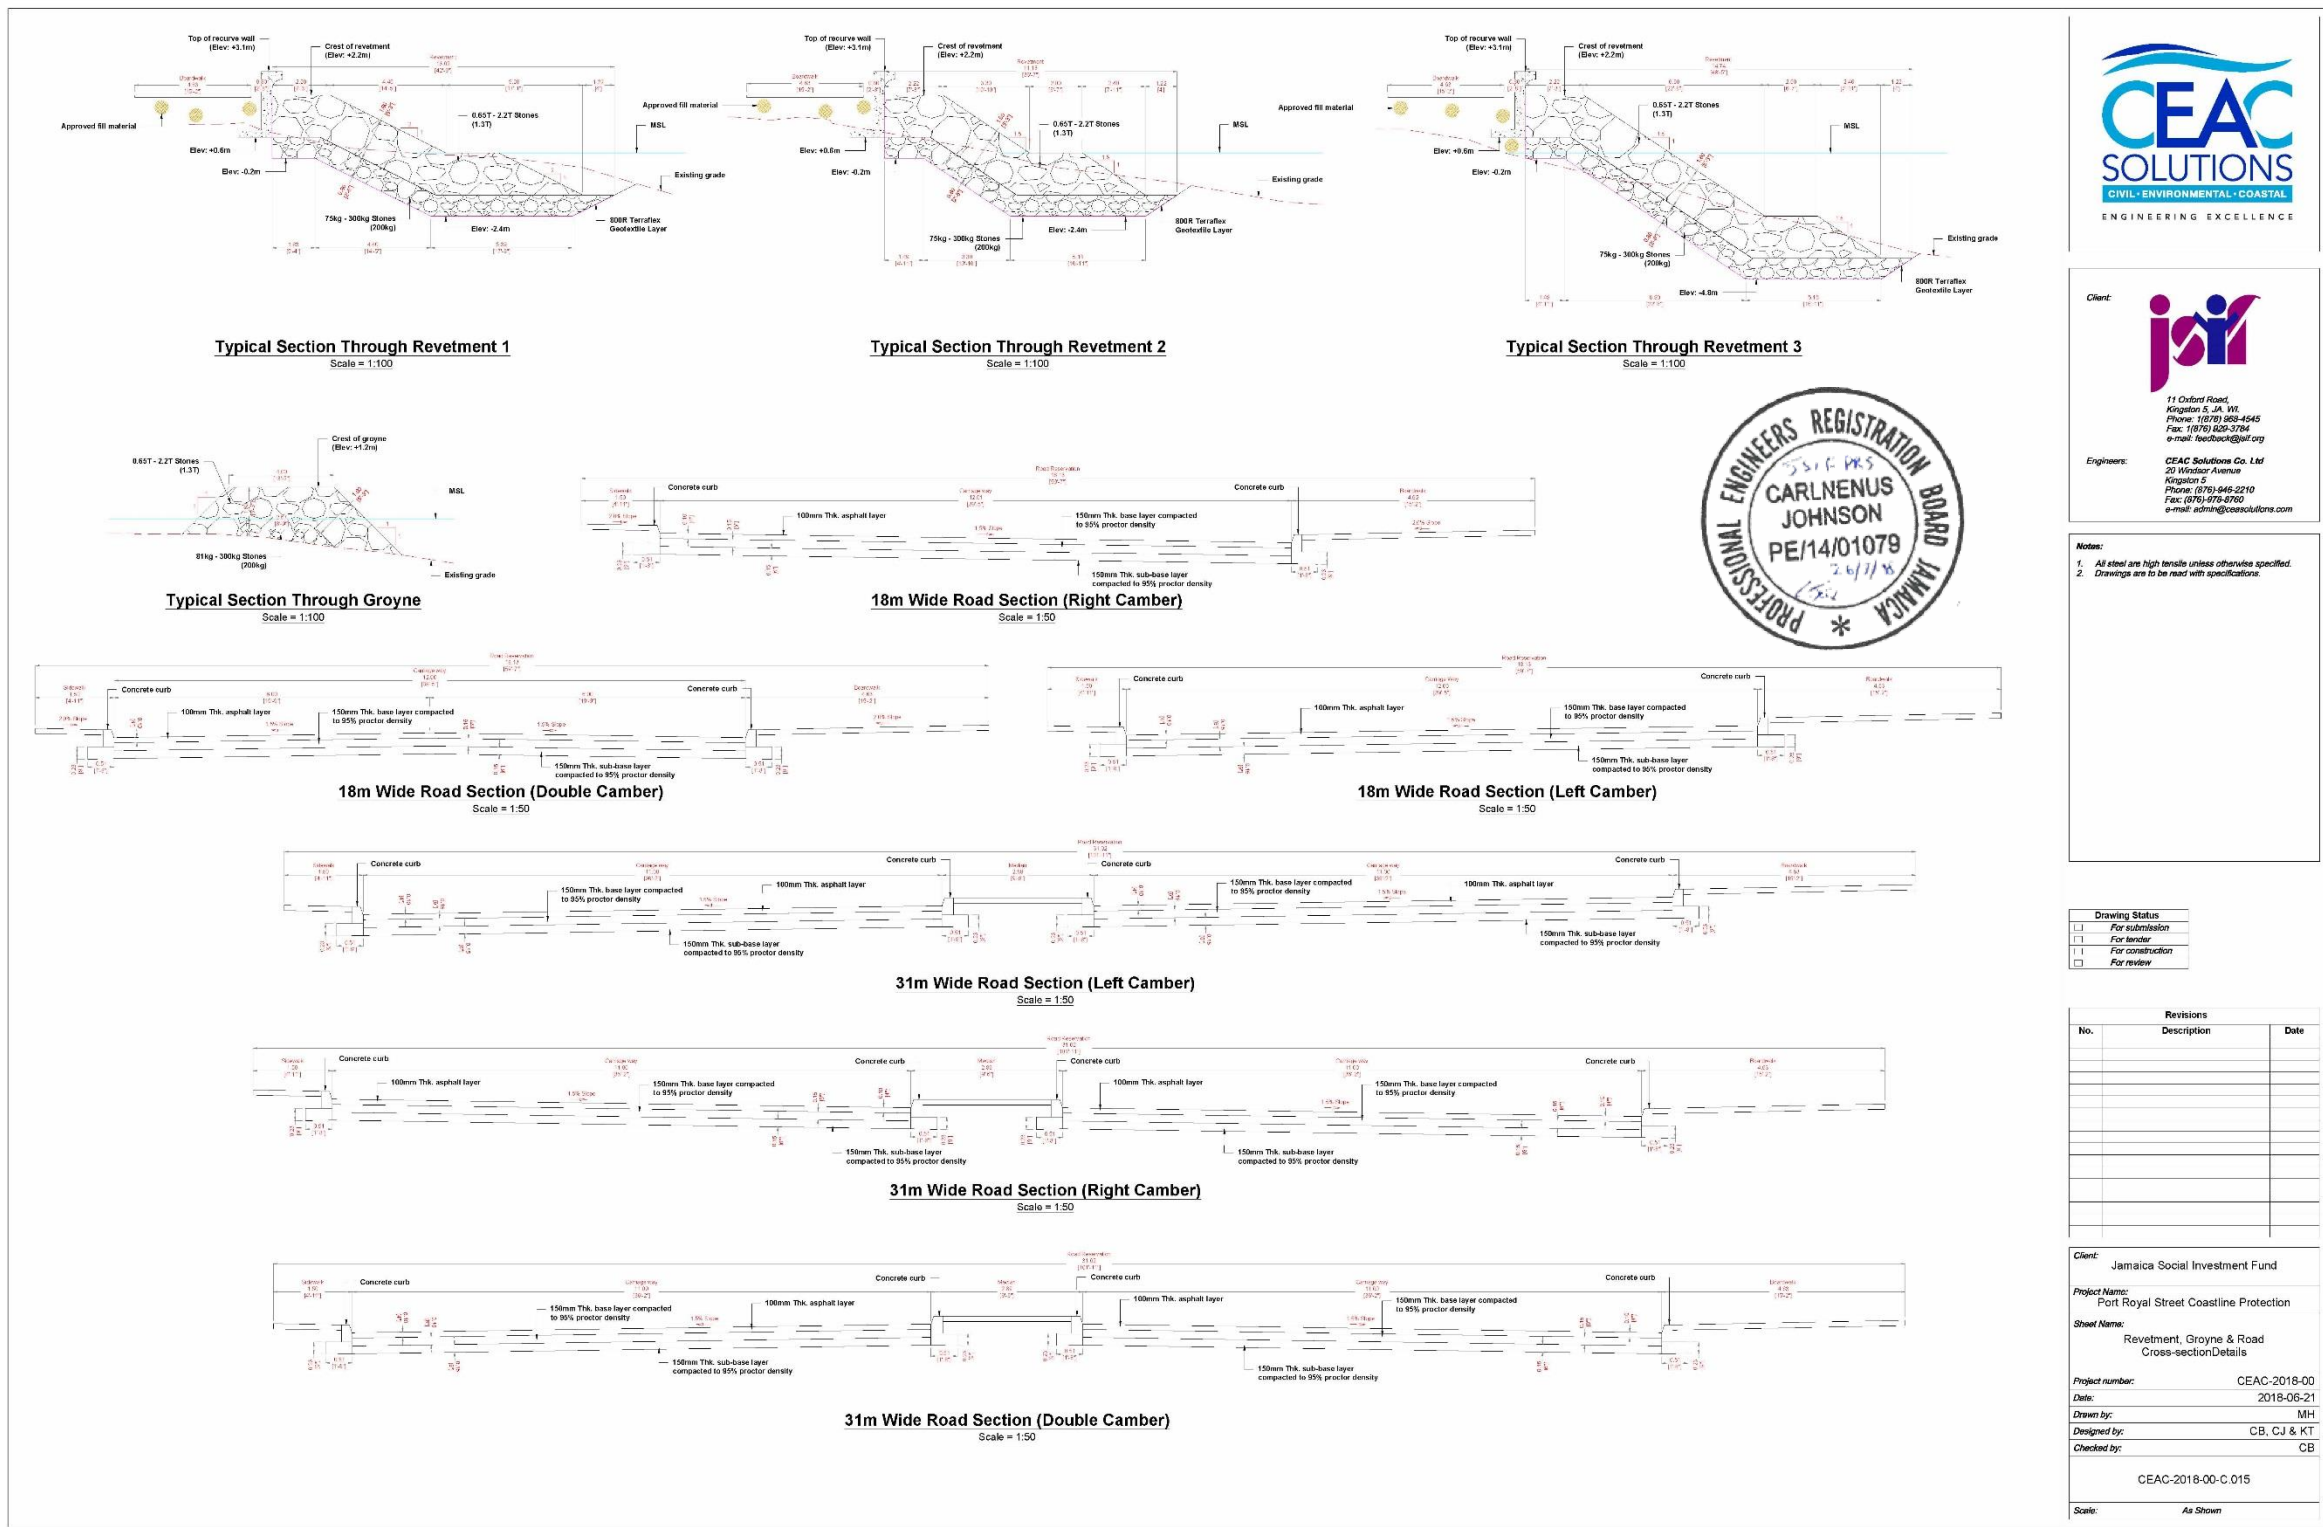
Revetment, Groyne and Road Cross-Section Details
